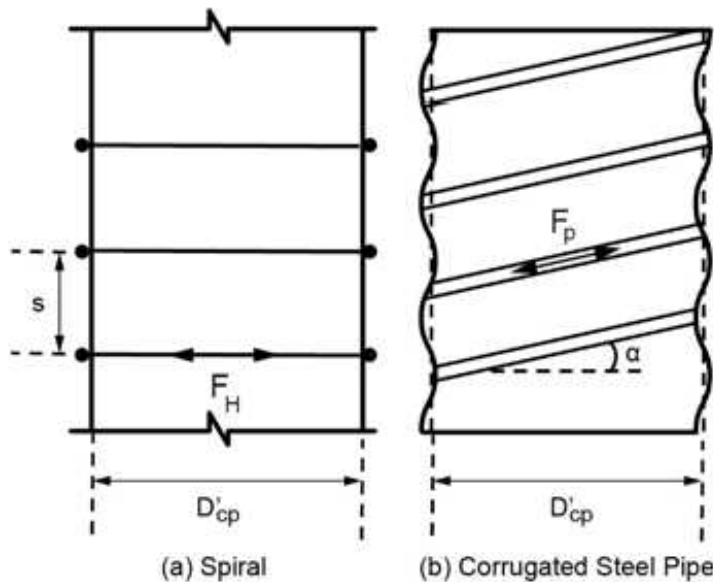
Confinement Provided by Spiral and Corrugated Steel Pipe
